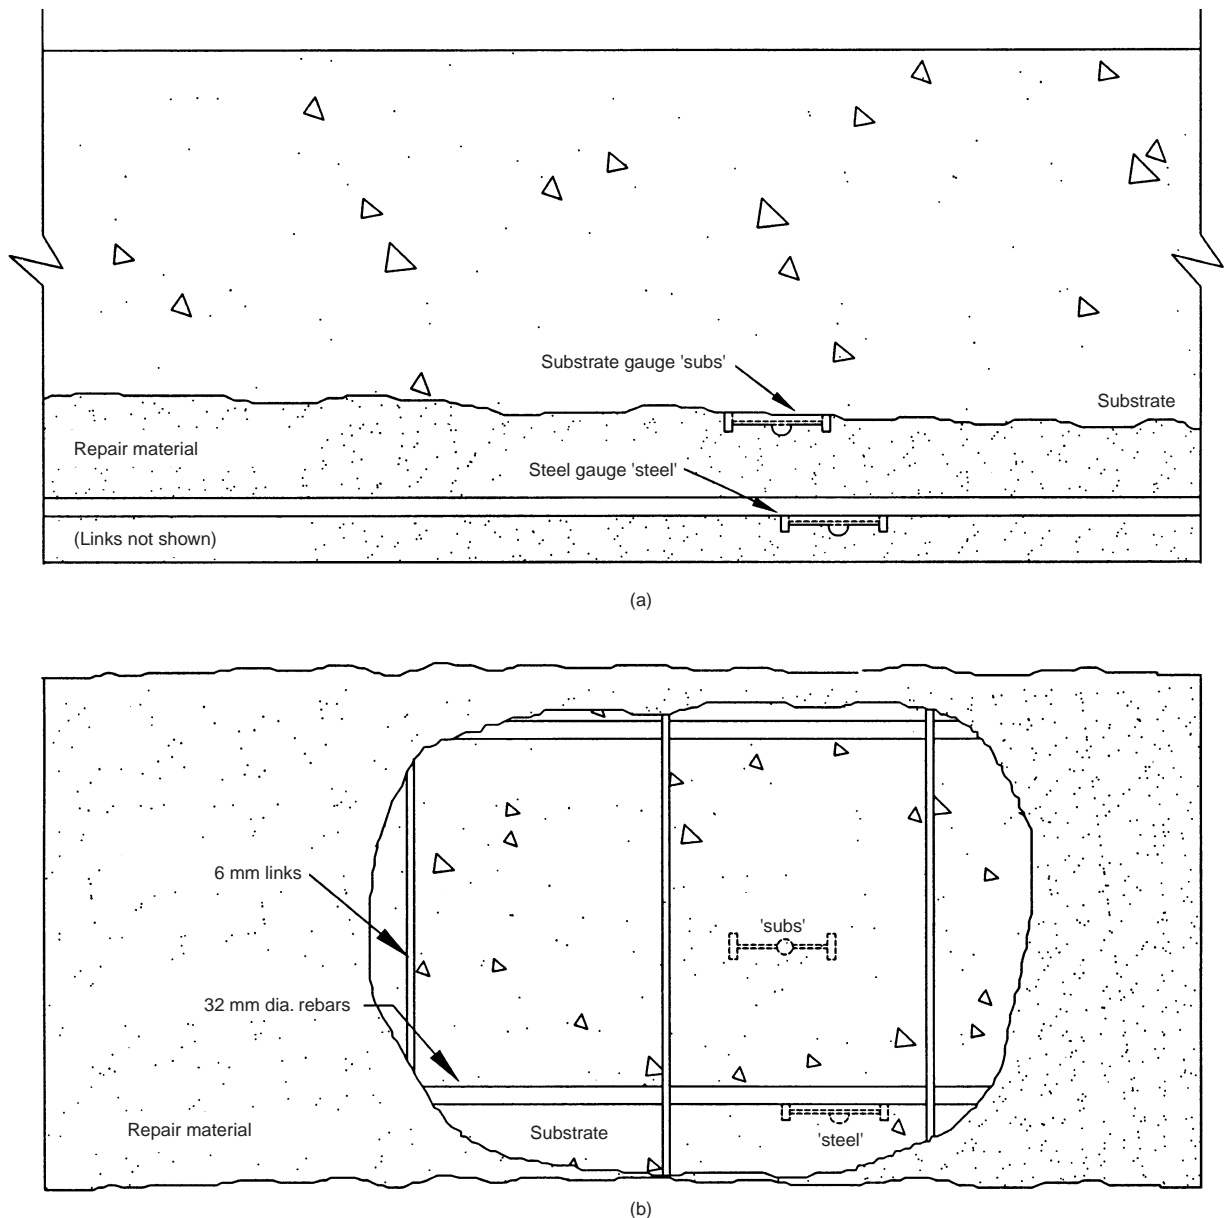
Location of strain gauges in the repair patch (portal frame beams, Sutherland Street bridge): (a) elevation of beam section; and (b) internal view from soffit
